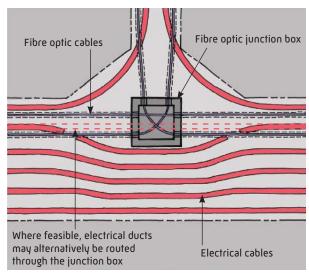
Typical electrical and fibre optic cable spacing arrangement
